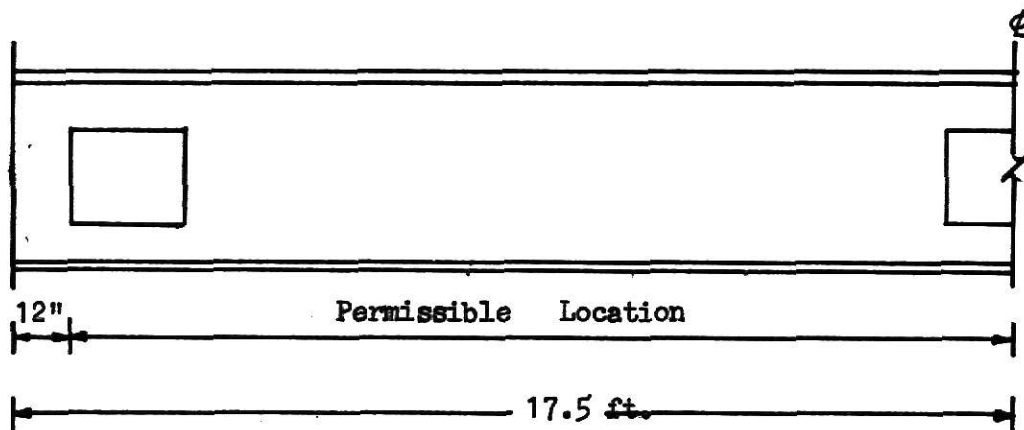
Permissible Opening Location for Floor Beam with $A_T = 1.0$ sq.in.
